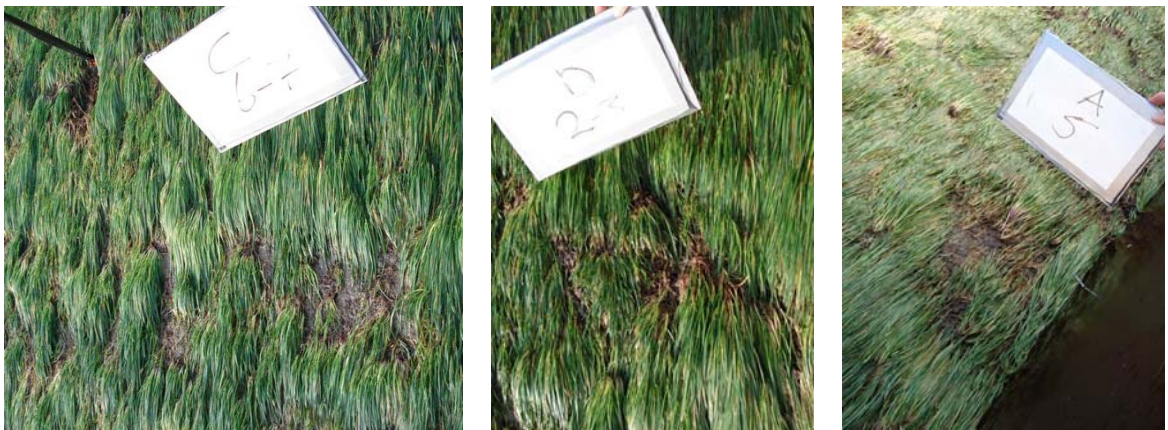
Detailed photographs of some bare spots after the 10 l/s/m test at the unreinforced test section
